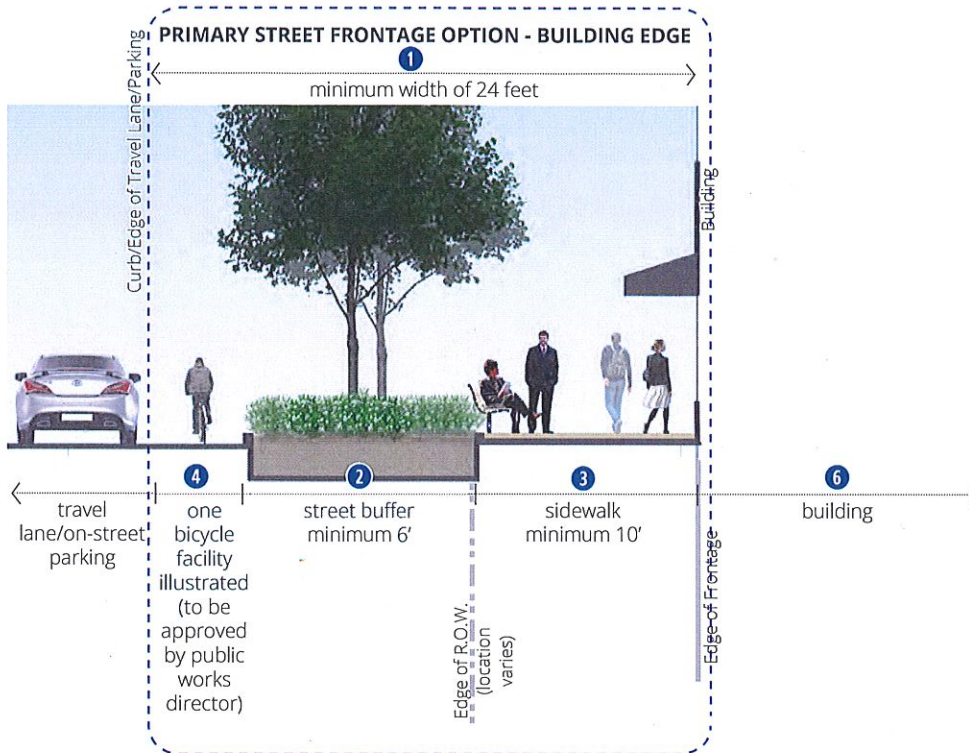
Primary Street Frontage Option - Building Edge
